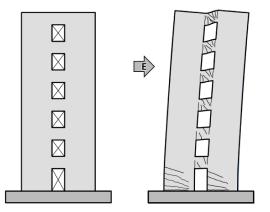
Coupled wall geometry and target yield mechanism.
